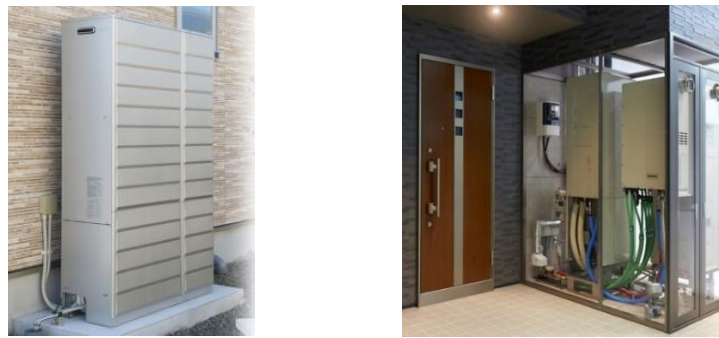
EXAMPLE OF OUTDOOR/INDOOR INSTALLATIONS
